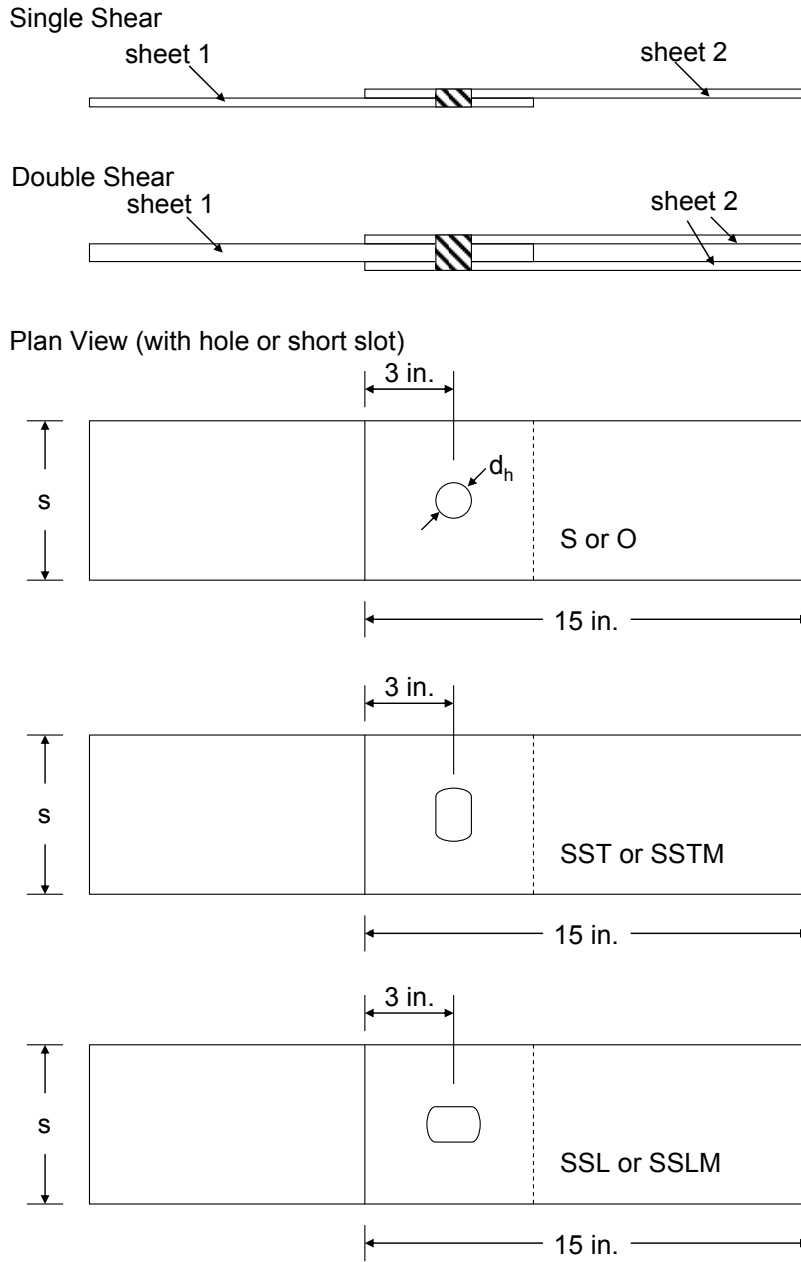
Dimensions of Specimens with One Bolt for Rupture in Net Section
